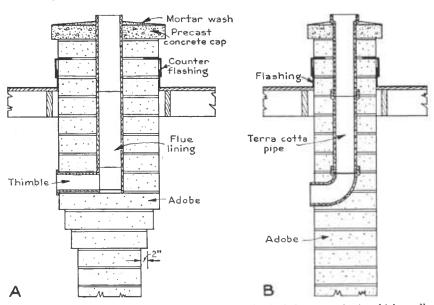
Chimneys built of adobe bricks: A, Corbeling to obtain thick walls that lessen the fire hazard due to erosion of mortar in the joints; B, in very cheap houses and shelters a 6-inch glazed tile is often built into the adobe wall as shown.
